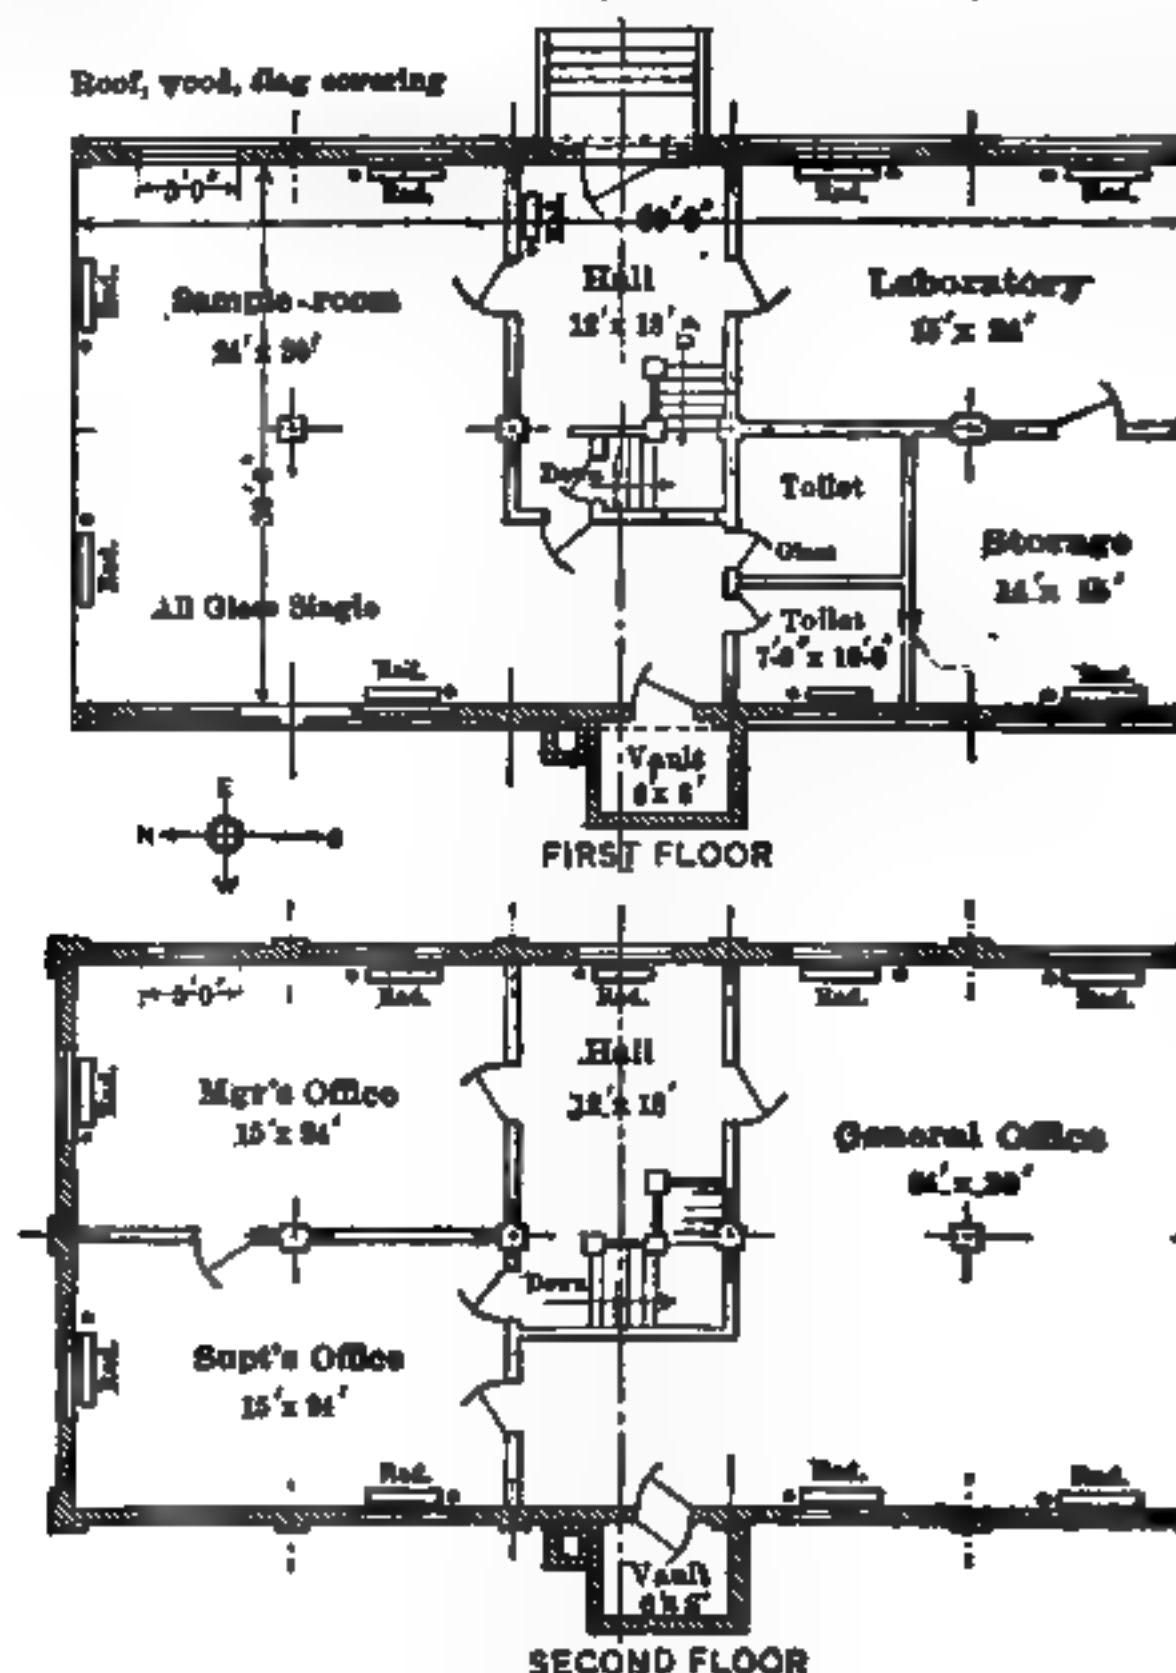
Floor-plans and Section of Building Explained in Table VII. (See, also, Fig. 1)
